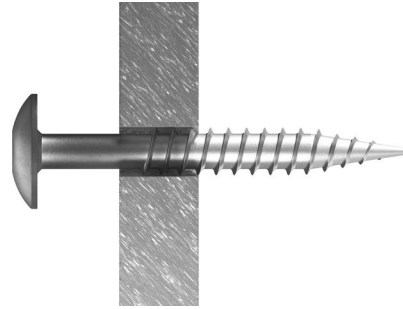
Swisspearl Patina Inline installation of cut to size board.
